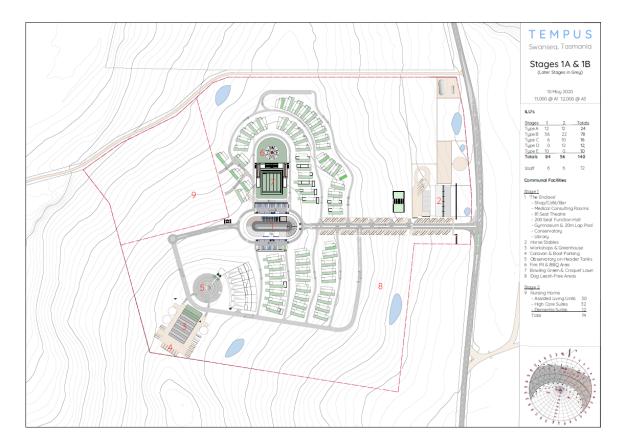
Tempus Stages 1A and 1B Plan
